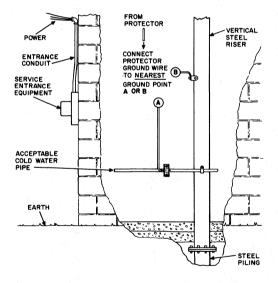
Acceptable Water System or Building Ground—Power Service Not Grounded
